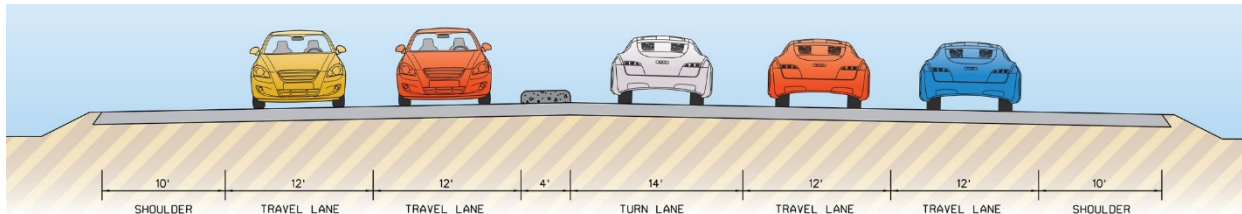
Typical Cross Section for Parkway Alternative (East of Six Mile Canyon Road)
